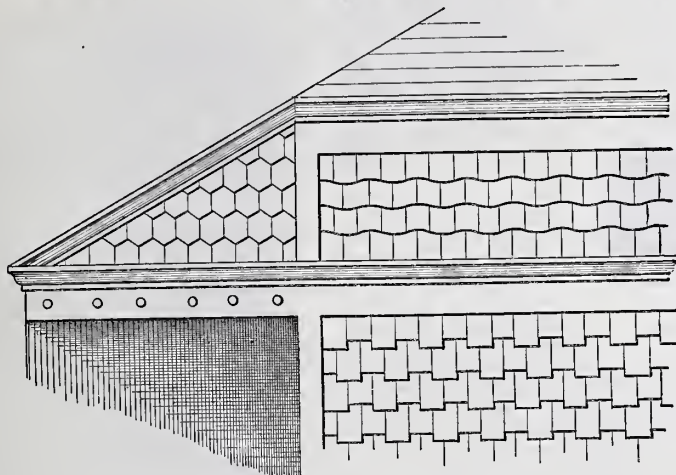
Cuttings of Slate from the Battery Place Station of the Elevated Railways, New York City.
